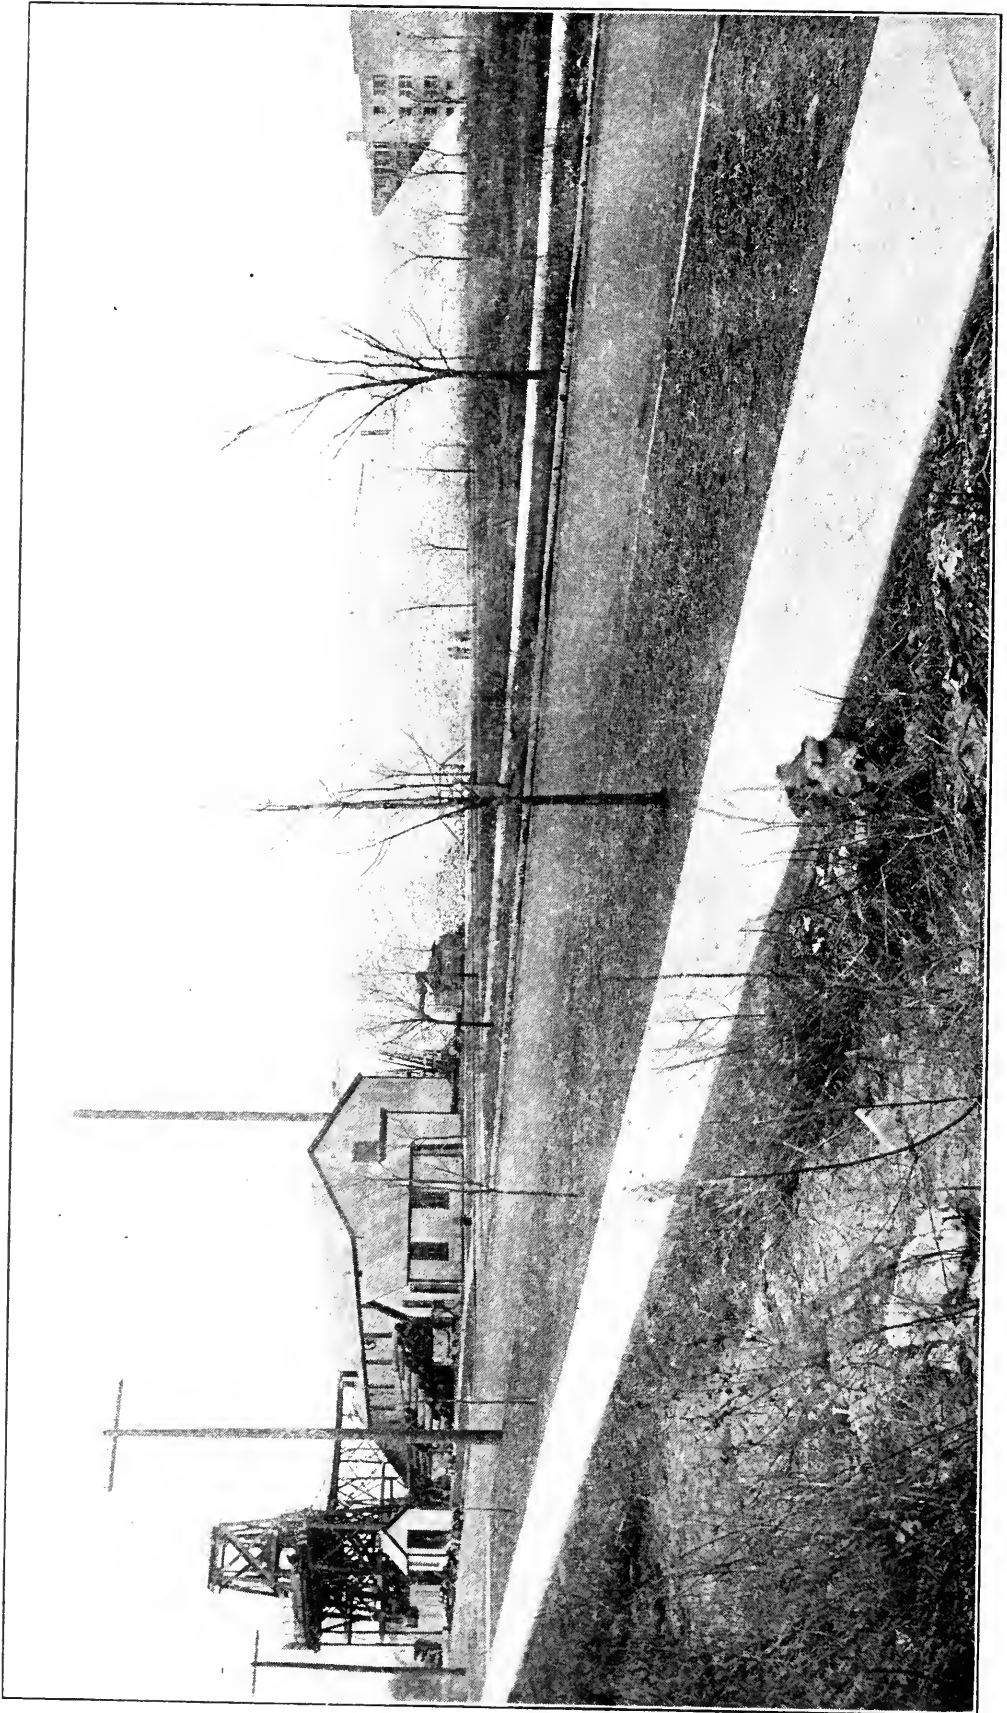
Typical view showing construction plant and rock pile at each shaft.
